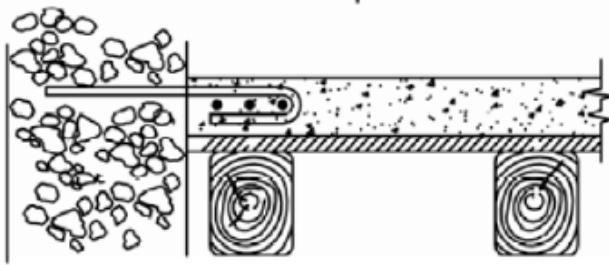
Steel bars used for connection improvement (from E. Vintzilaiou – “Lecture notes on Advanced Mechanics of Masonry”)
